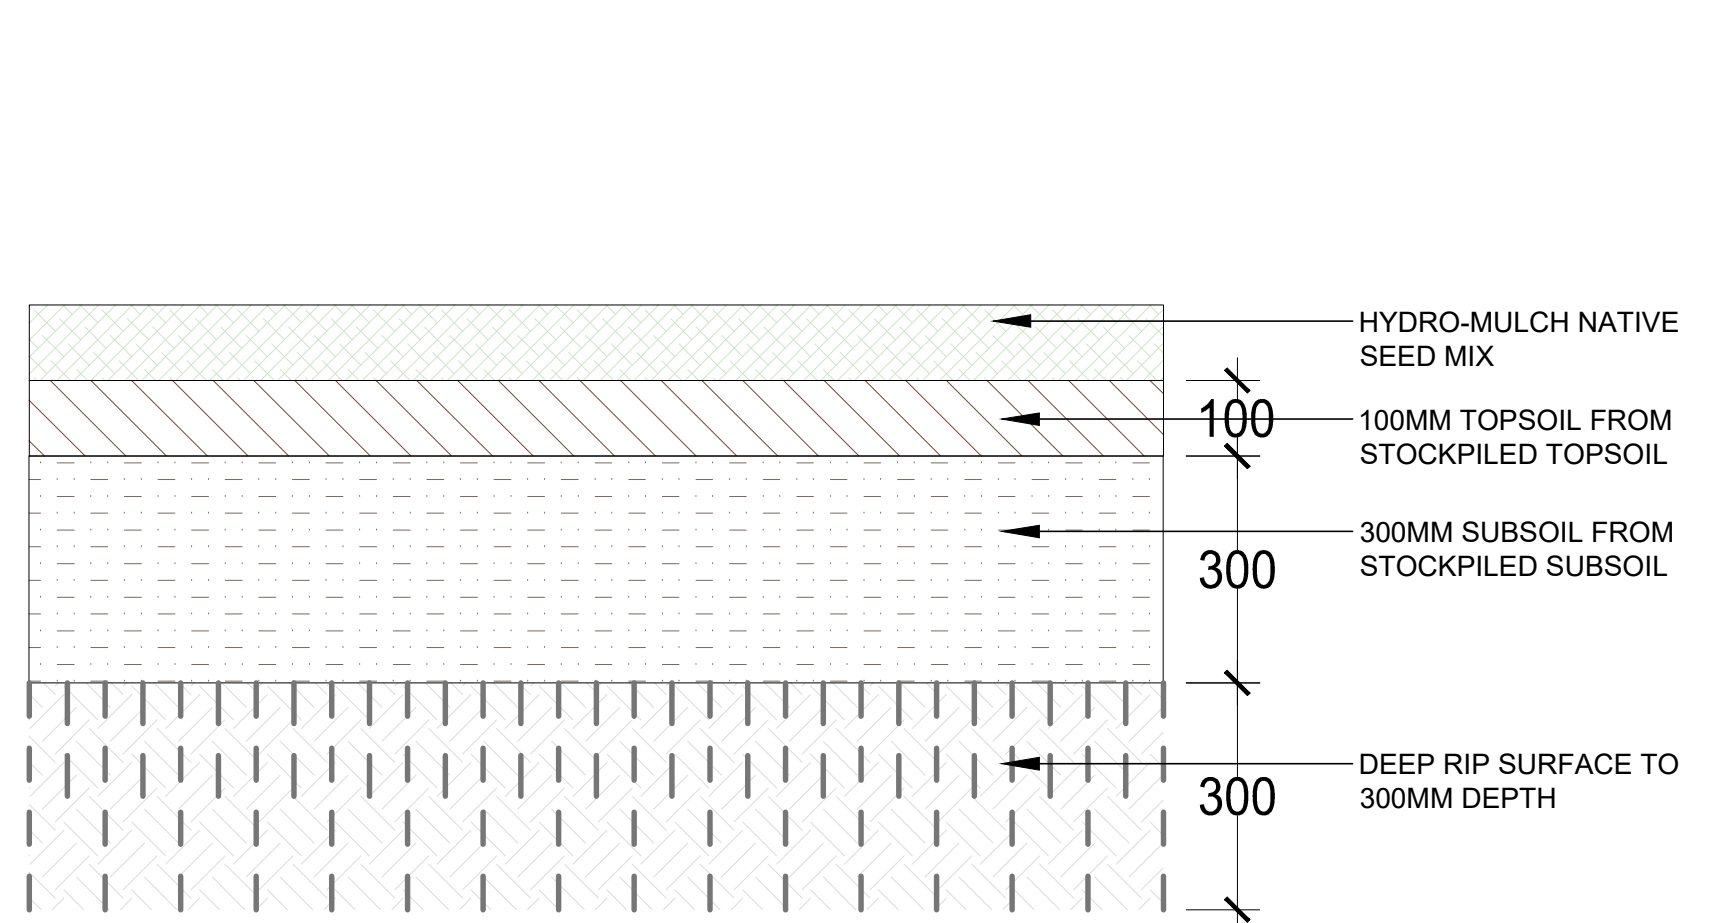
PLANTING FOR EMBANKMENTS STEEPER THAN 1V:3H GRADE
